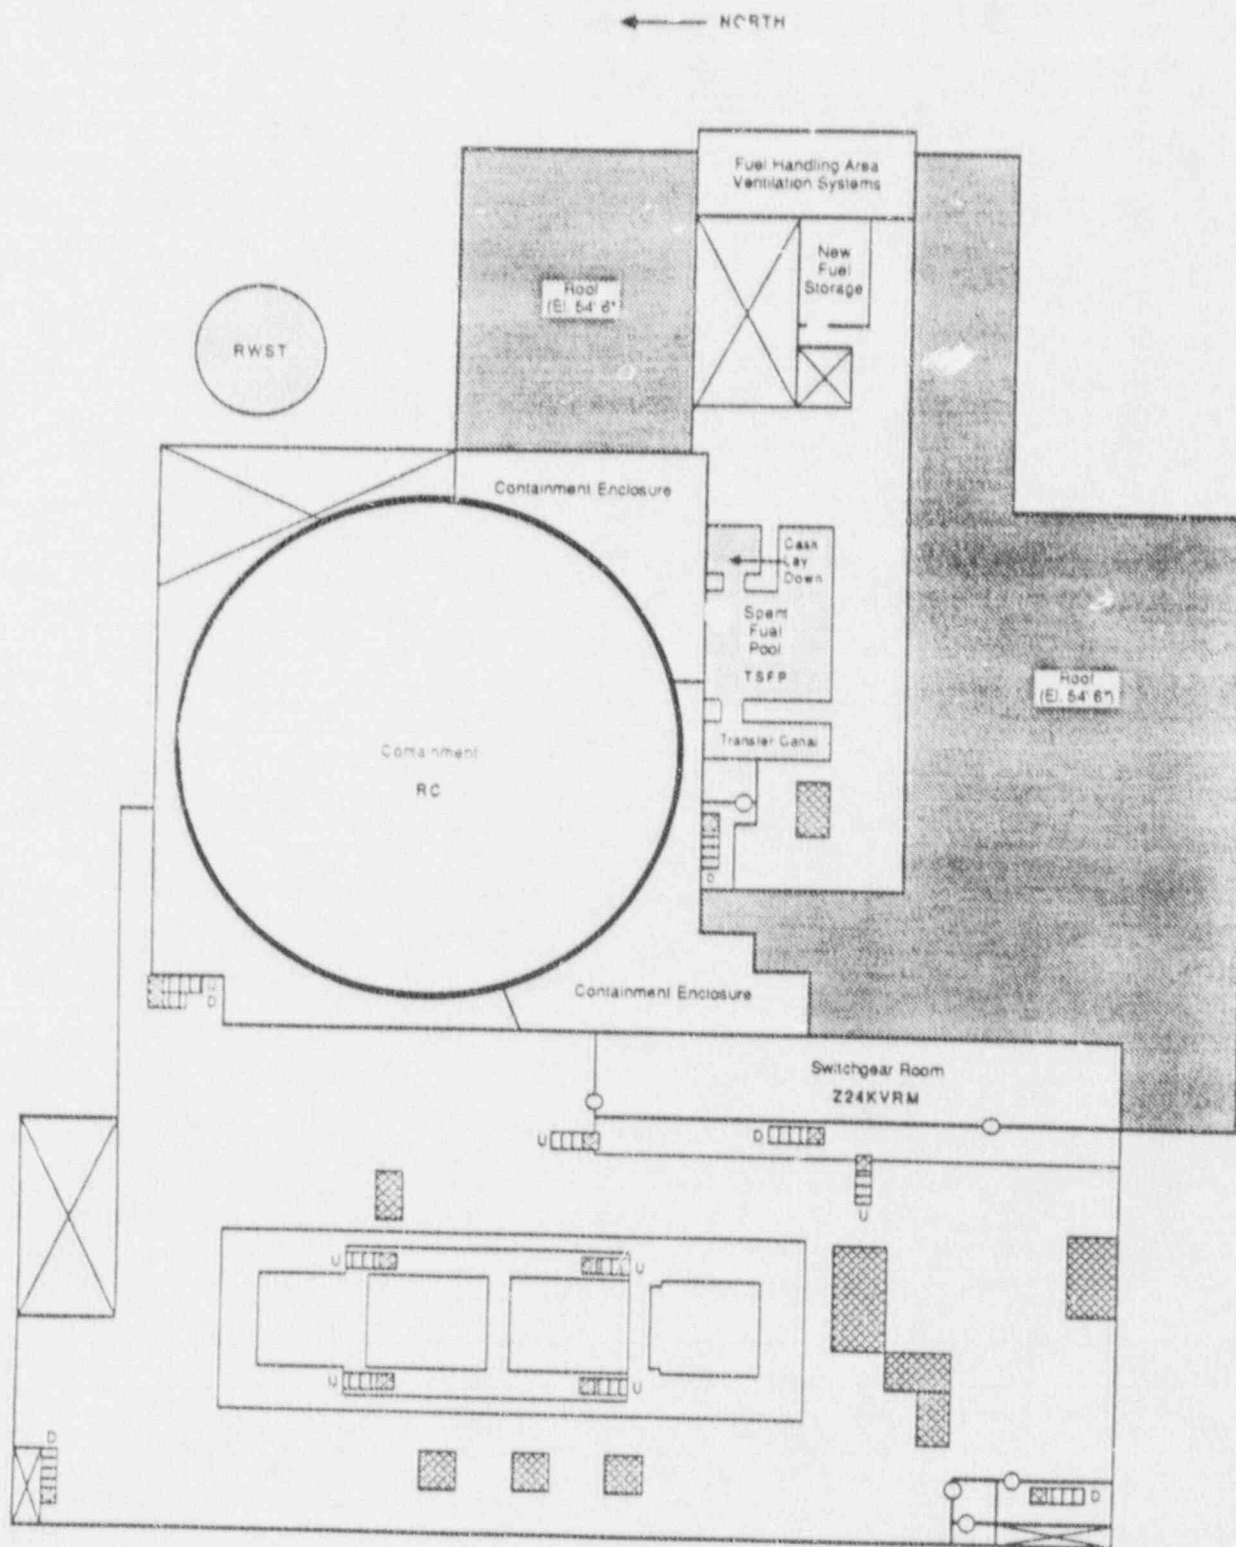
Millstone 2 Containment, Auxiliary, and Turbine Buildings, Elevation 54' 6"
